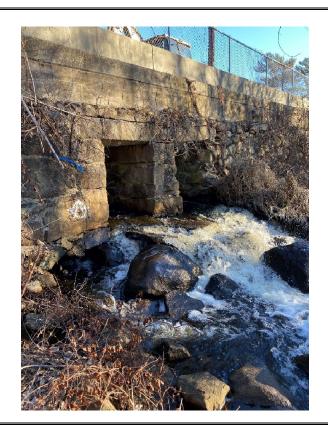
South Elevation. Void under Southwest Wingwall/Abutment. 42.106967, -70.940408
